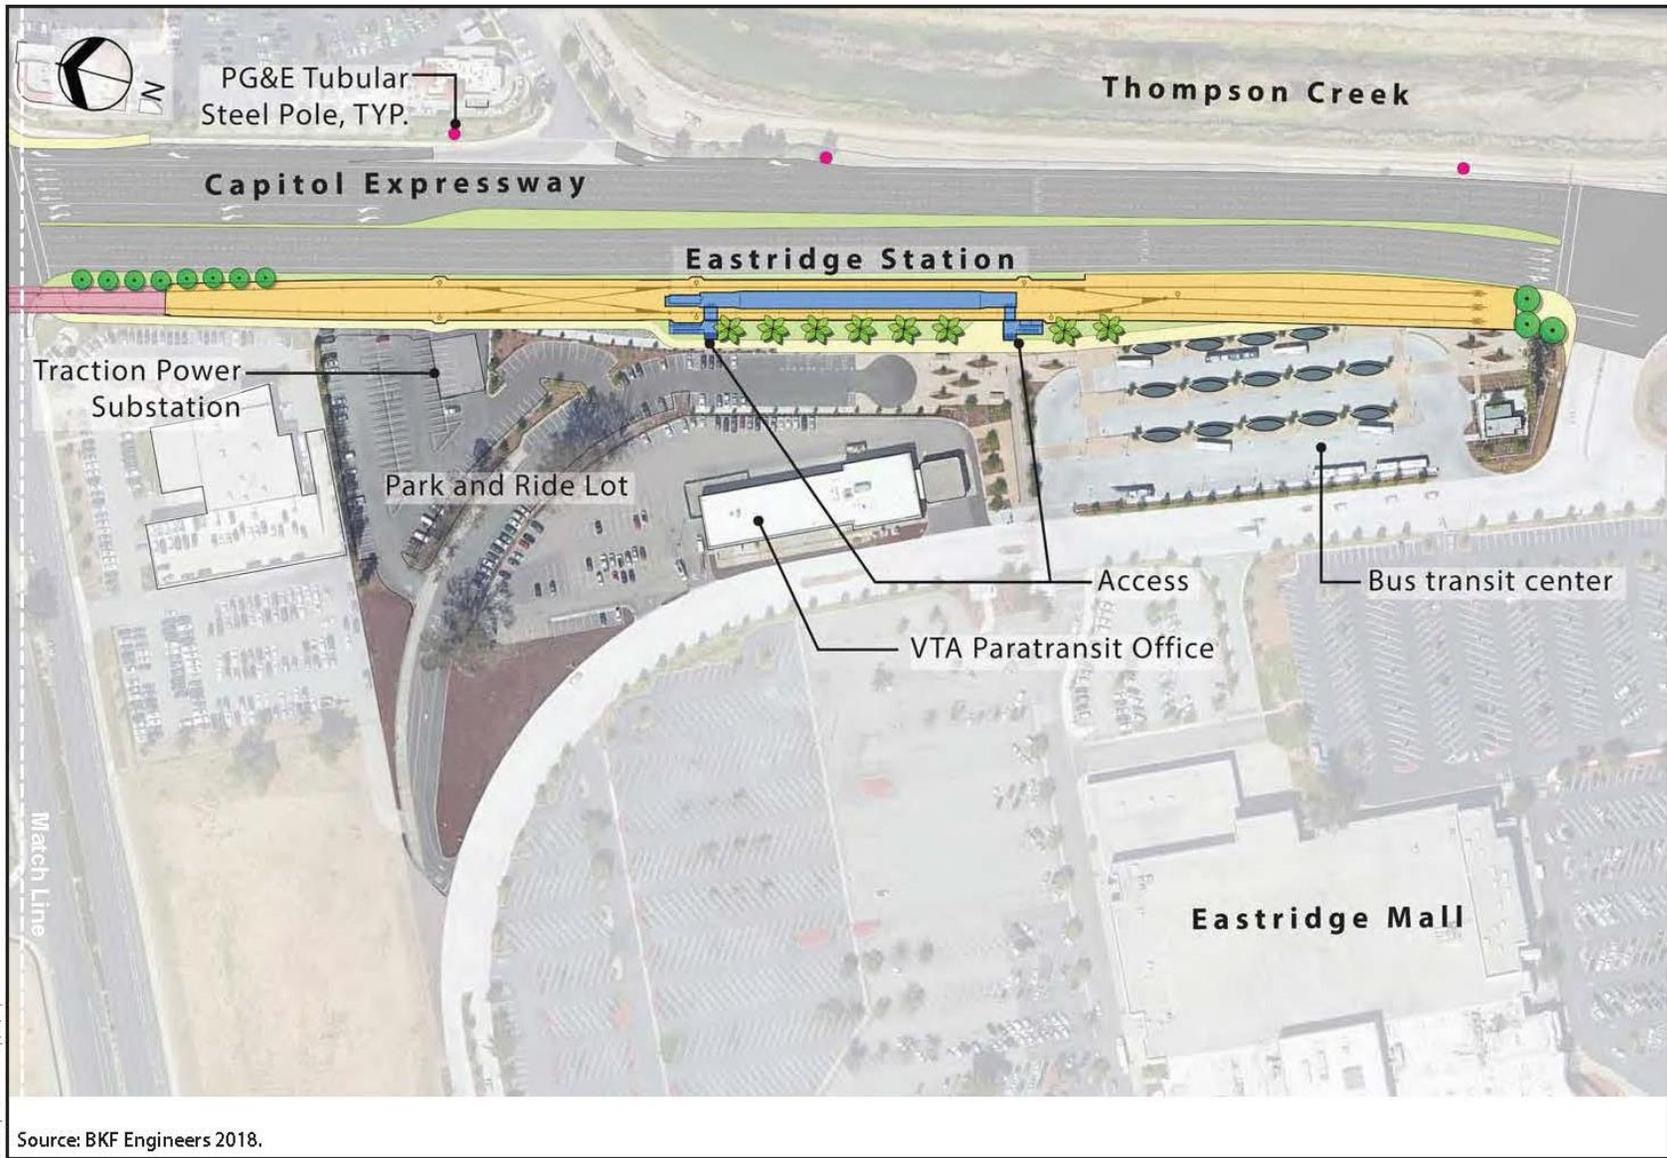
Recommended Light Rail Alternative at Eastridge Station
